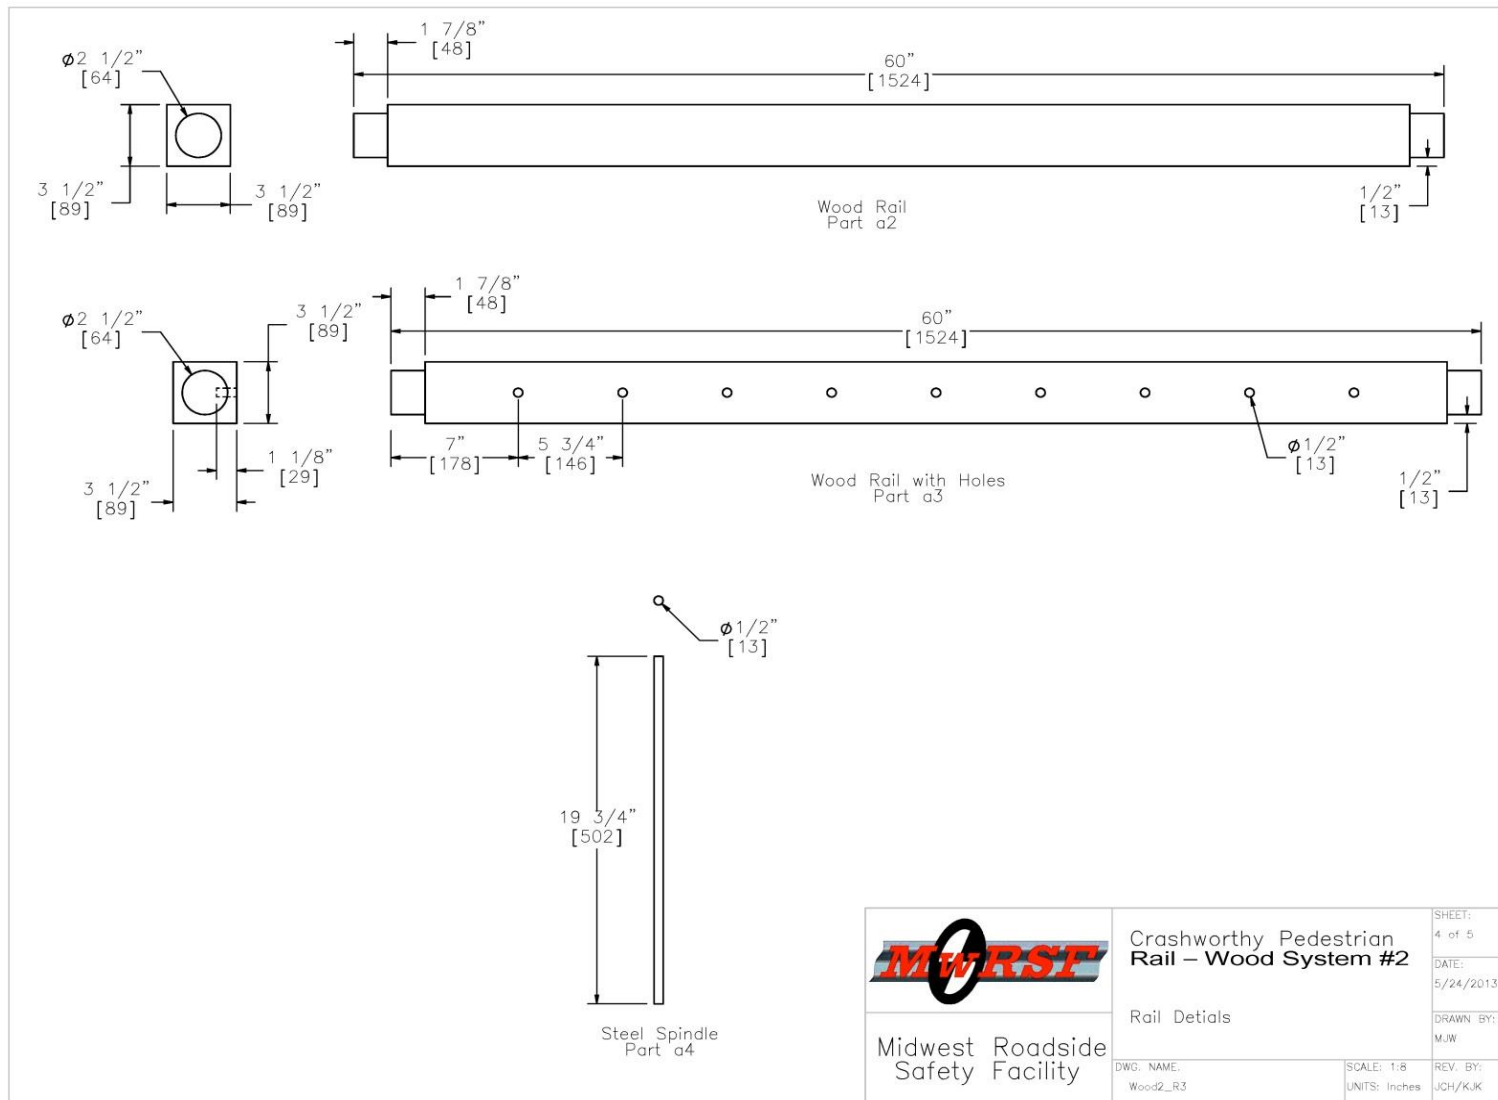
Cutout Wood Rail, Design Concept WOOD2 (Sheet 4 of 5)
